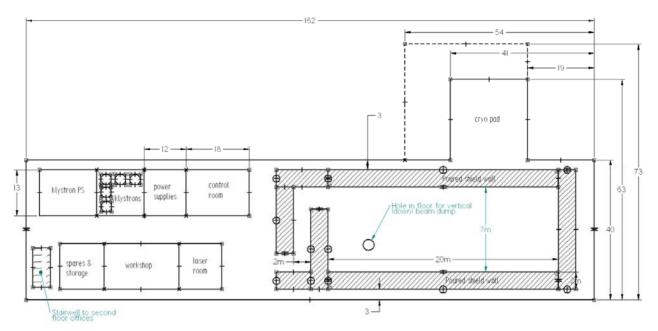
Preliminary layout of the NPS-FEL laboratory building. All dimensions without units are in feet.
